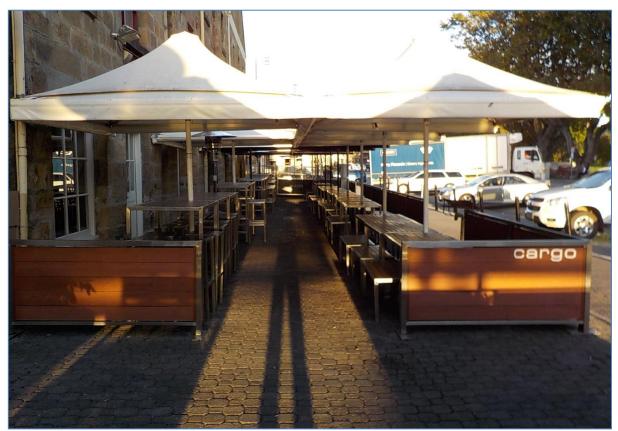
Existing Conditions – Salamanca Place (Kennedy Lane to Wooby's Lane)
